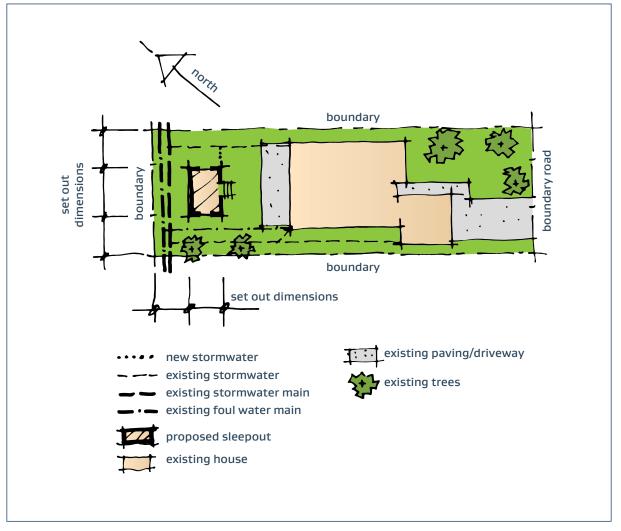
Simple site plan showing the location of the sleepout on the property with all key elements of the site included
